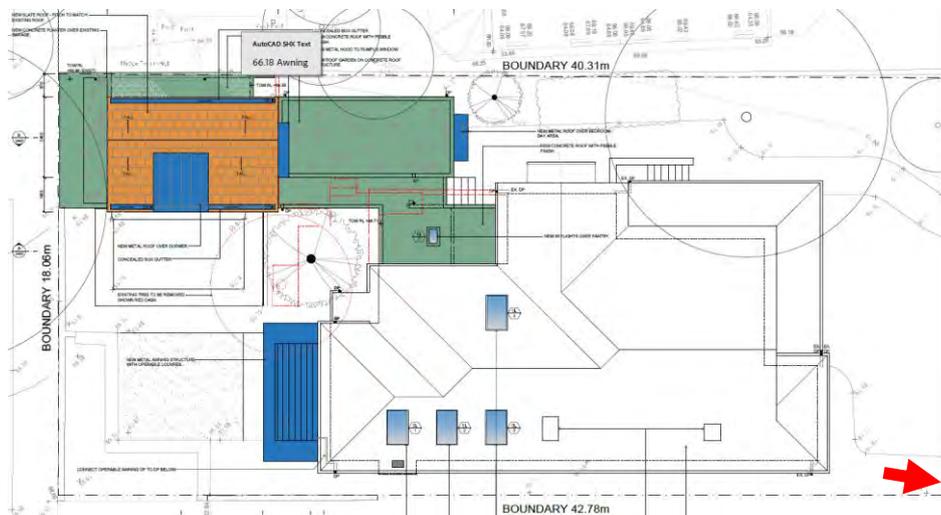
Proposed roof plan. (Source: Castlepeake Architecture)
